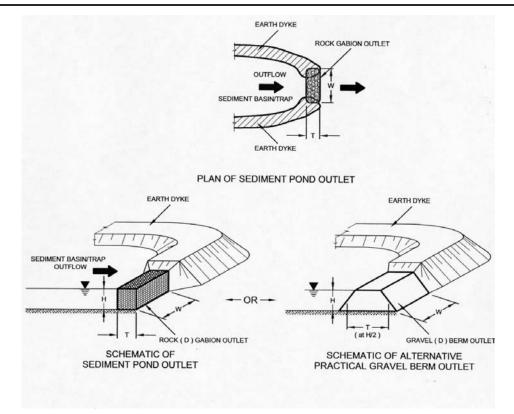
Model of Drainage Outlet of Sediment Pond
